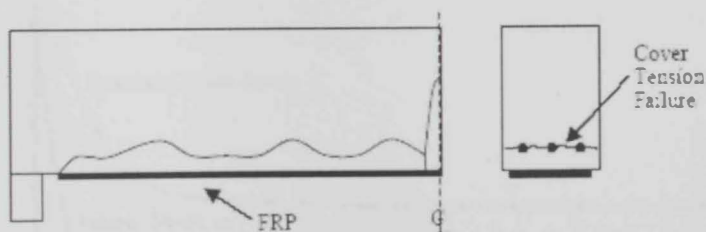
De-lamination caused by tension failure of the concrete cover
